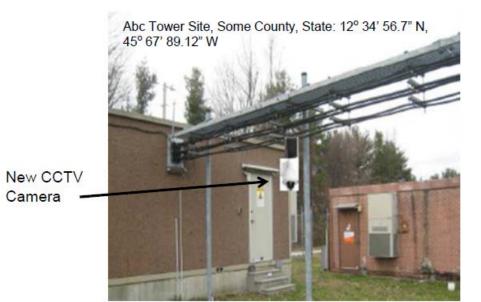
Ground-level photograph with graphic showing proposed equipment installation.
